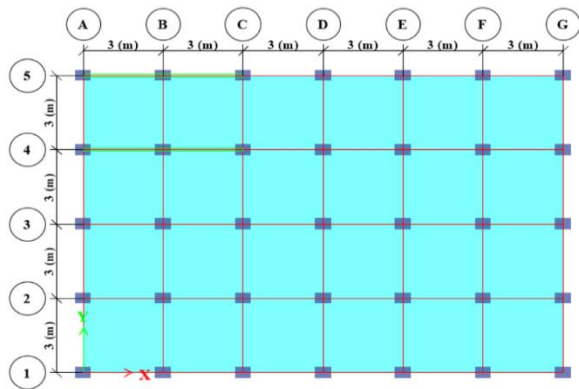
Model THI-1: shear wall of thickness 150mm at corner of building
